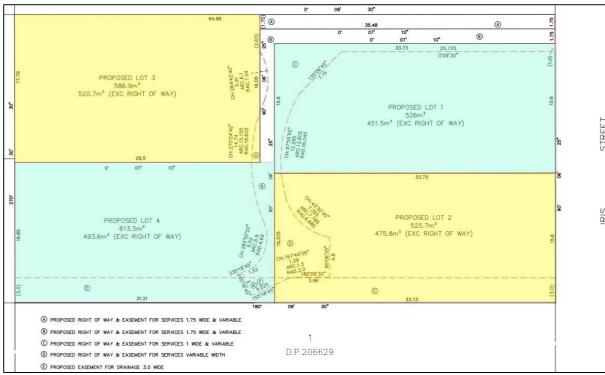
Extract from the submitted plan of subdivision prepared by Michael K Joyce, Surveyor.
